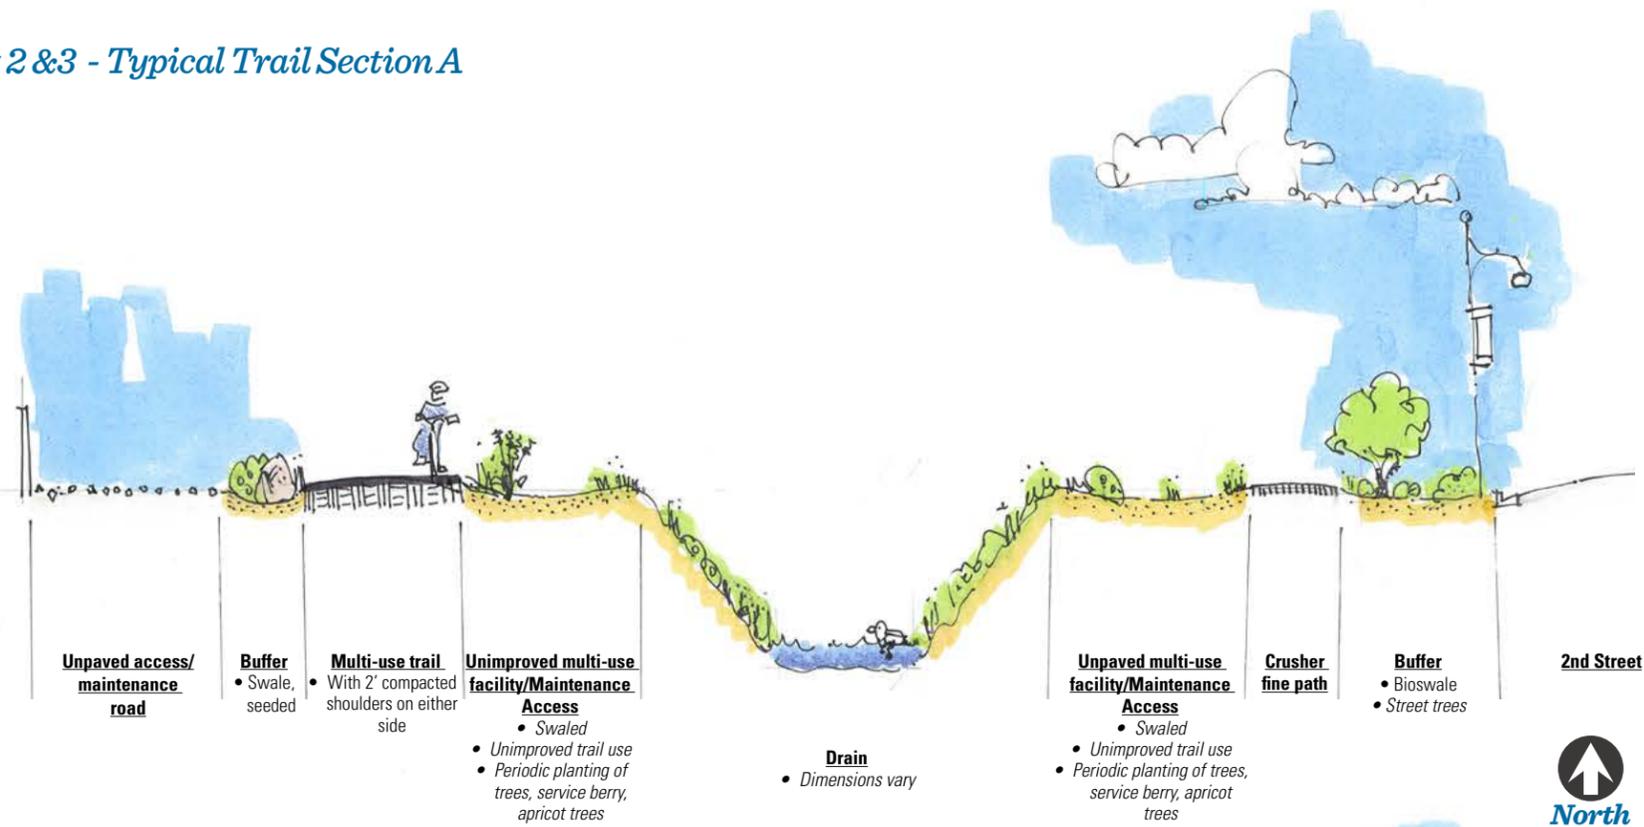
Segment 2 &3 - Typical Trail Section A
